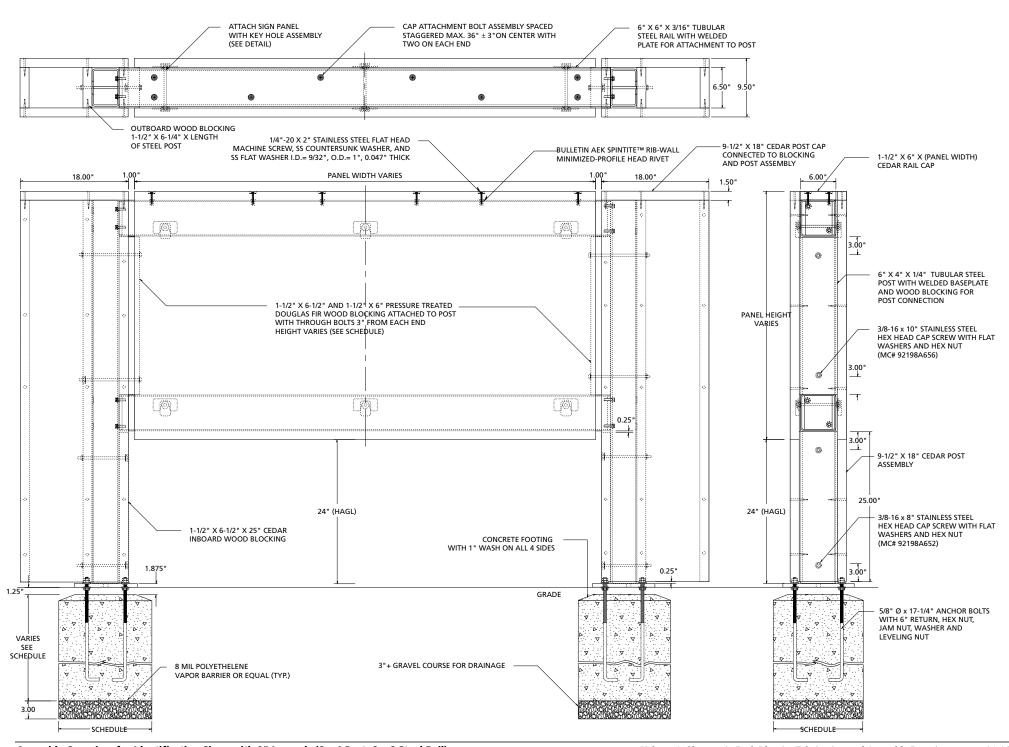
DETAIL E WOOD RAIL ASSEMBLY PLAN VIEW A'-A
